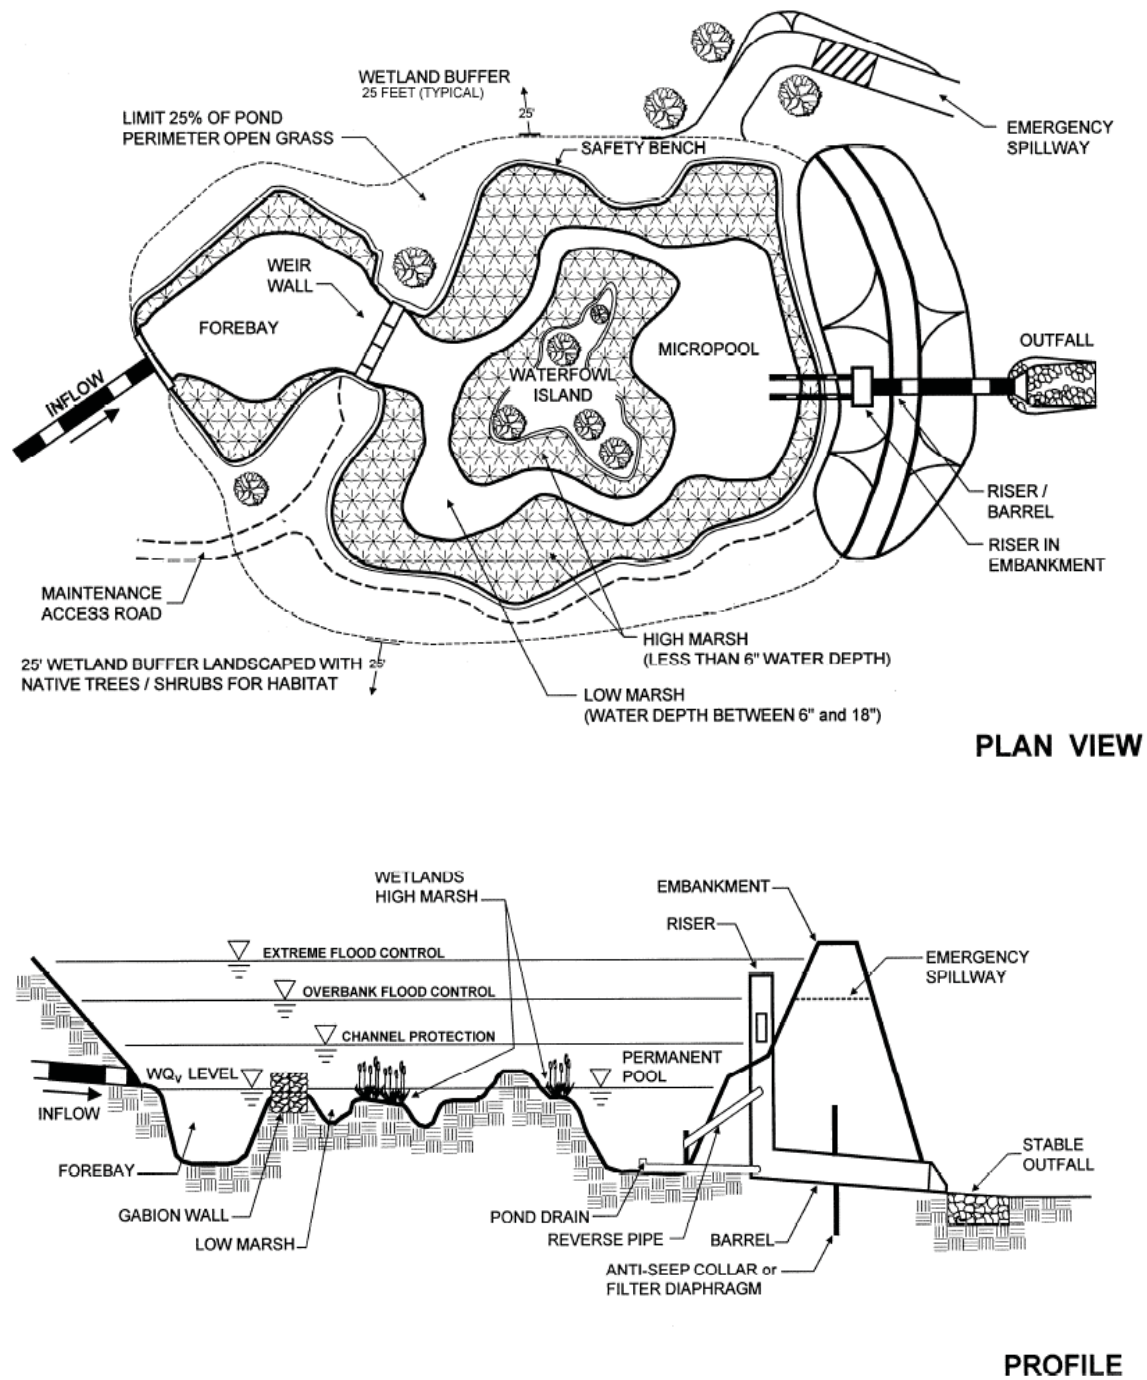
Stormwater wetland detention facility in plan and profile view (EPA 2009)
